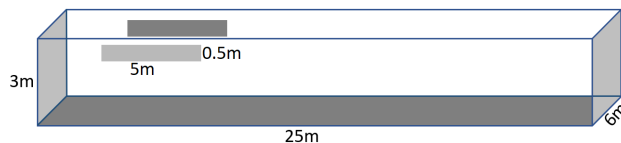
Diagram of the proposed common room dimensions, with internal walls and windows shaded.
